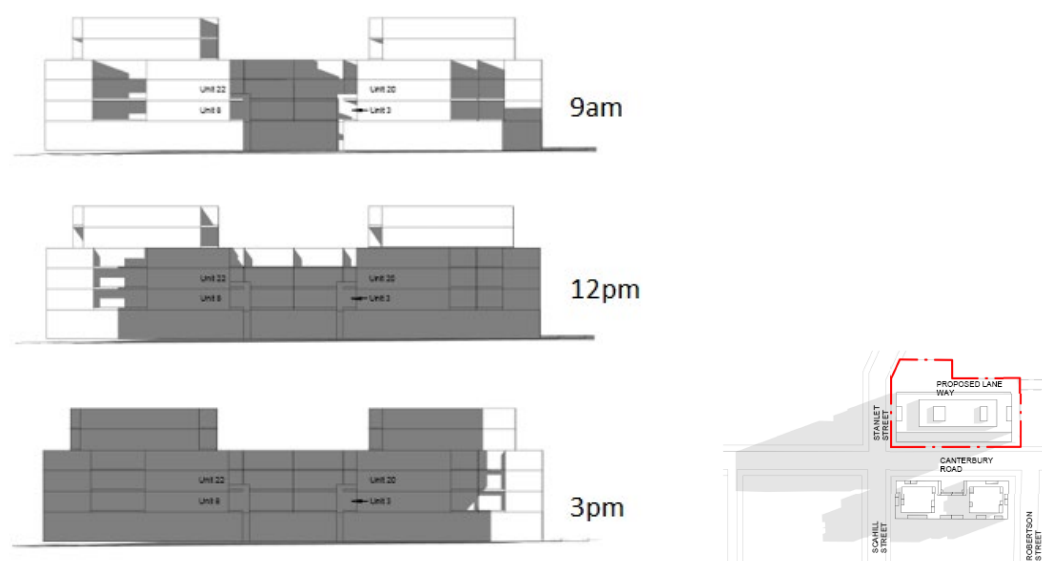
Winter Solstice solar access diagrams at 9am, 12pm and 3pm showing the north facing elevation of a potential future residential development on 1-5 Robertson Street and 412-416 Canterbury Road, Campsie (opposite the site, shown in inset).
